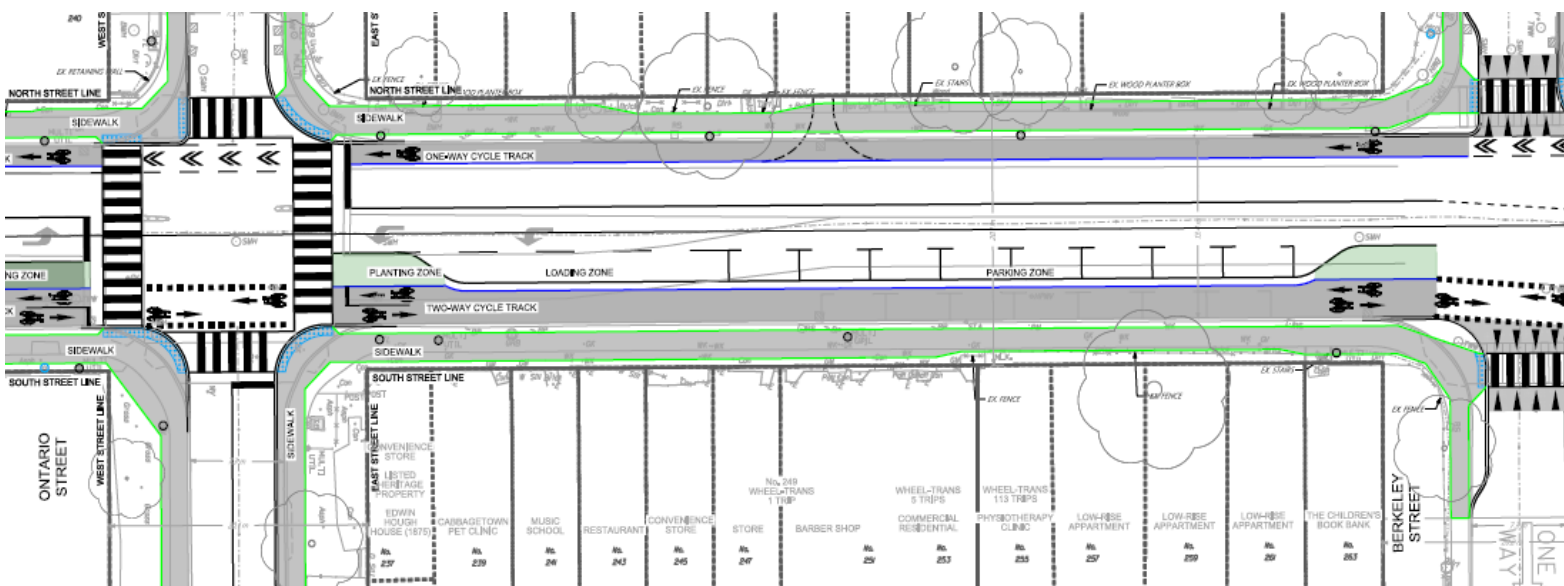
illustrates planned general lay-by for loading and parking on the south side of Gerrard Street East between Ontario Street and Berkeley Street.
